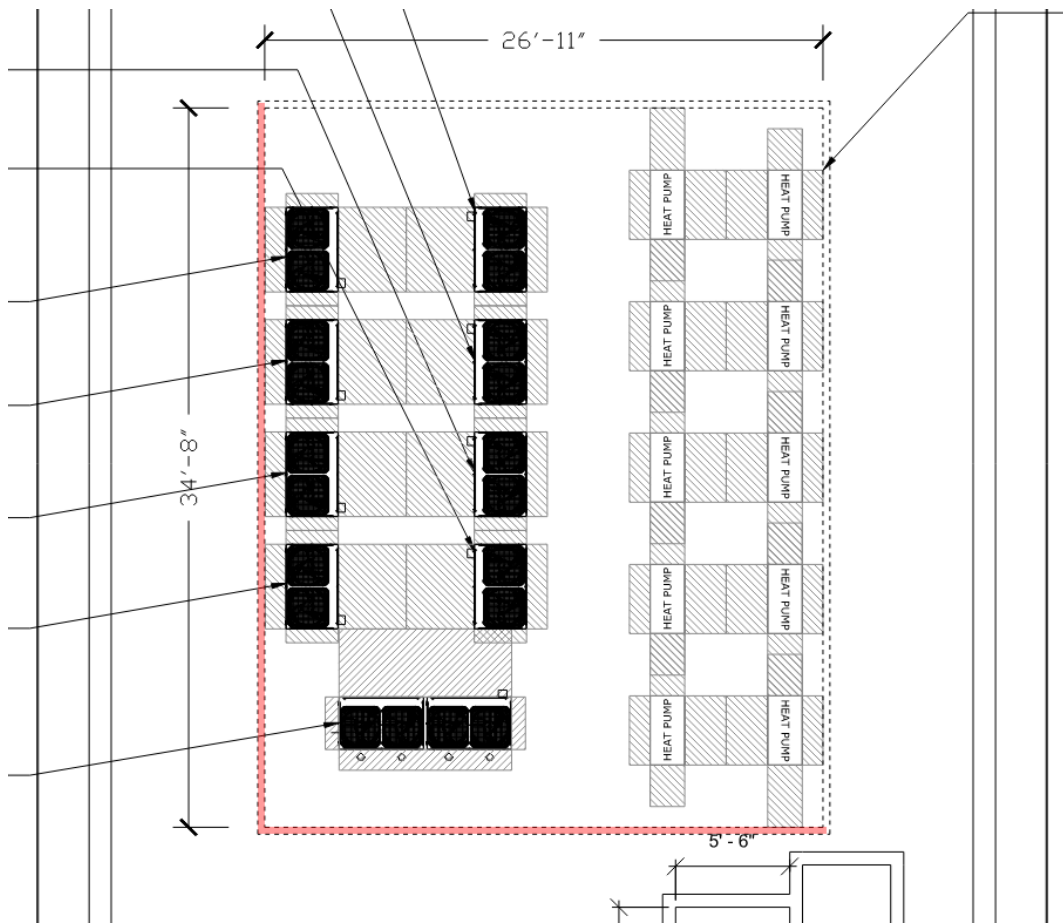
VRV Units and Heat Pumps on Rooftop of New Building 42
